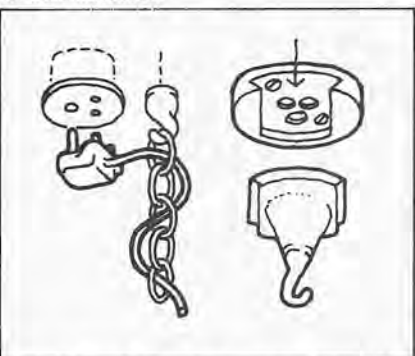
Left: A 5 amp plug and socket will allow easy removal of a pendant luminaire for cleaning. Right: A proprietary alternative.
